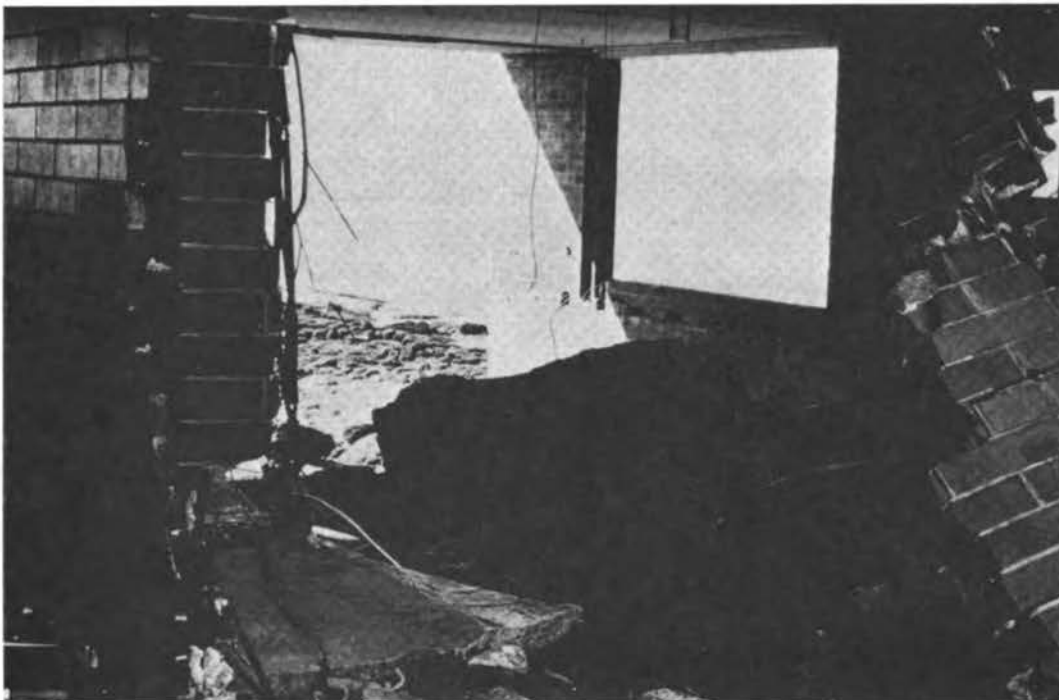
Damage to nonbearing wall of Kuhio Shores Condominium, Kauai.
